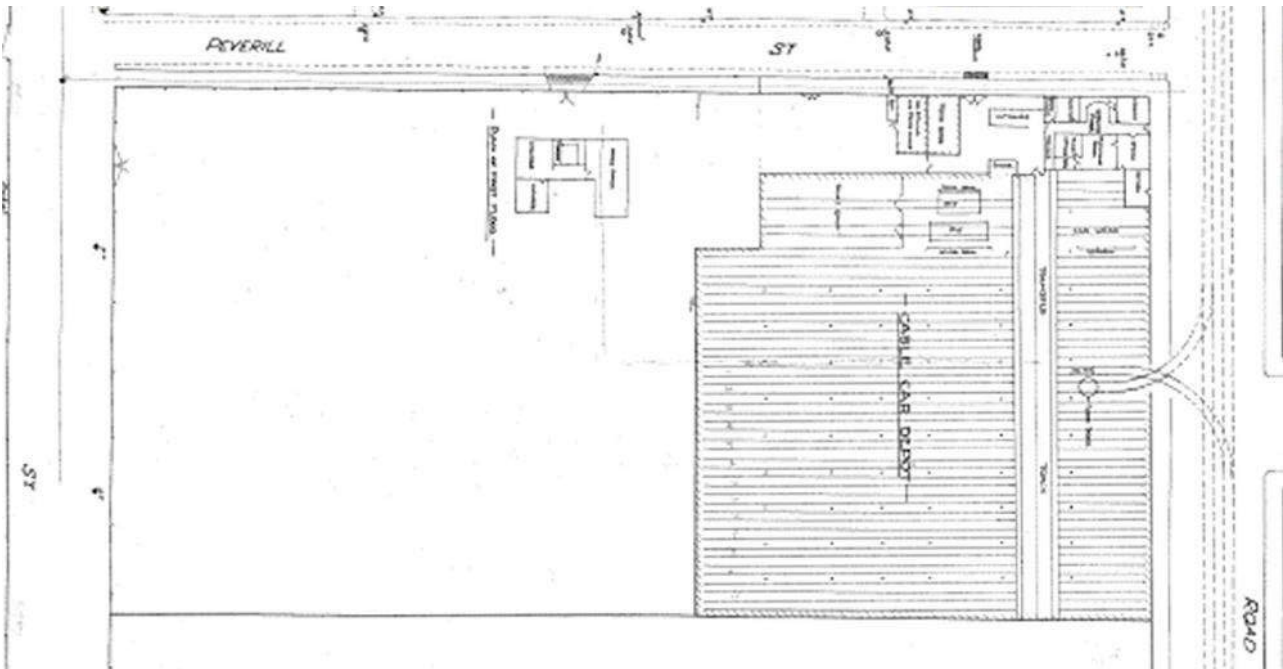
Detail from the 1931 MMTB plan of the Sydney Road cable car depot (Jacobs 2020)
